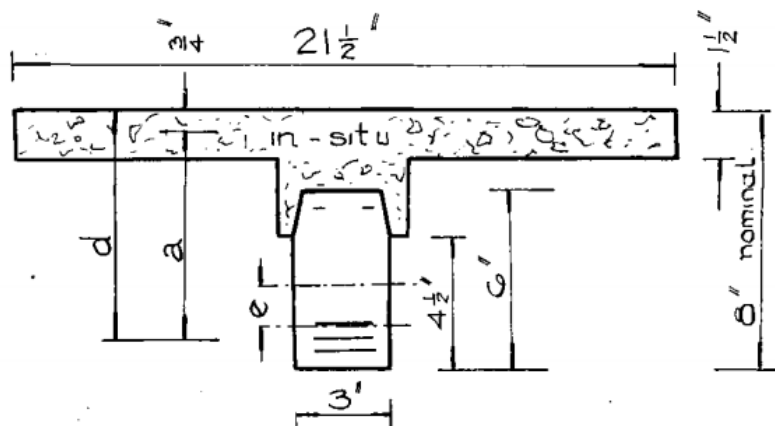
Cross-section of T-beam tested by Revesz (1953).
